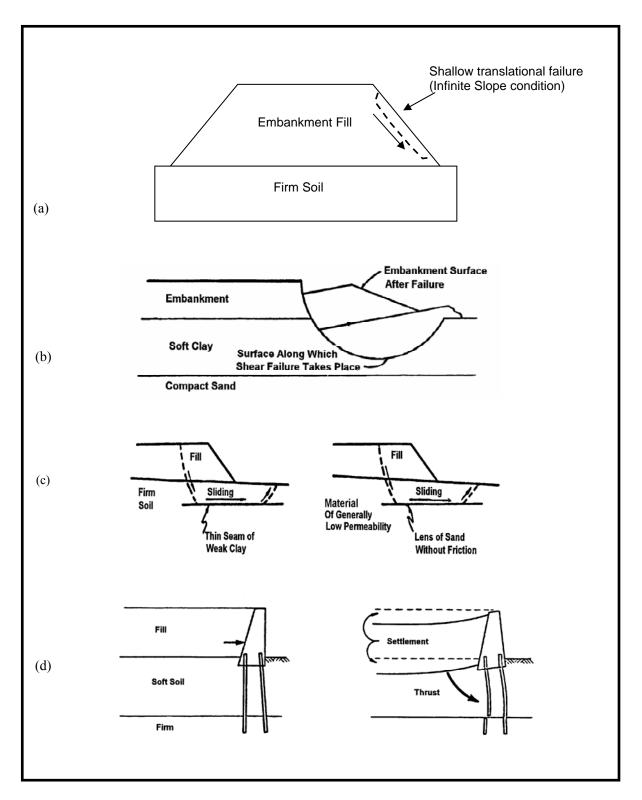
Embankment failures: (a) Infinite slope failure in embankment fill, (b) Circular arc failure in embankment fill and foundation soil, (c) Sliding block failure in embankment fill and foundation soil, and (d) Lateral squeeze of foundation soil.
